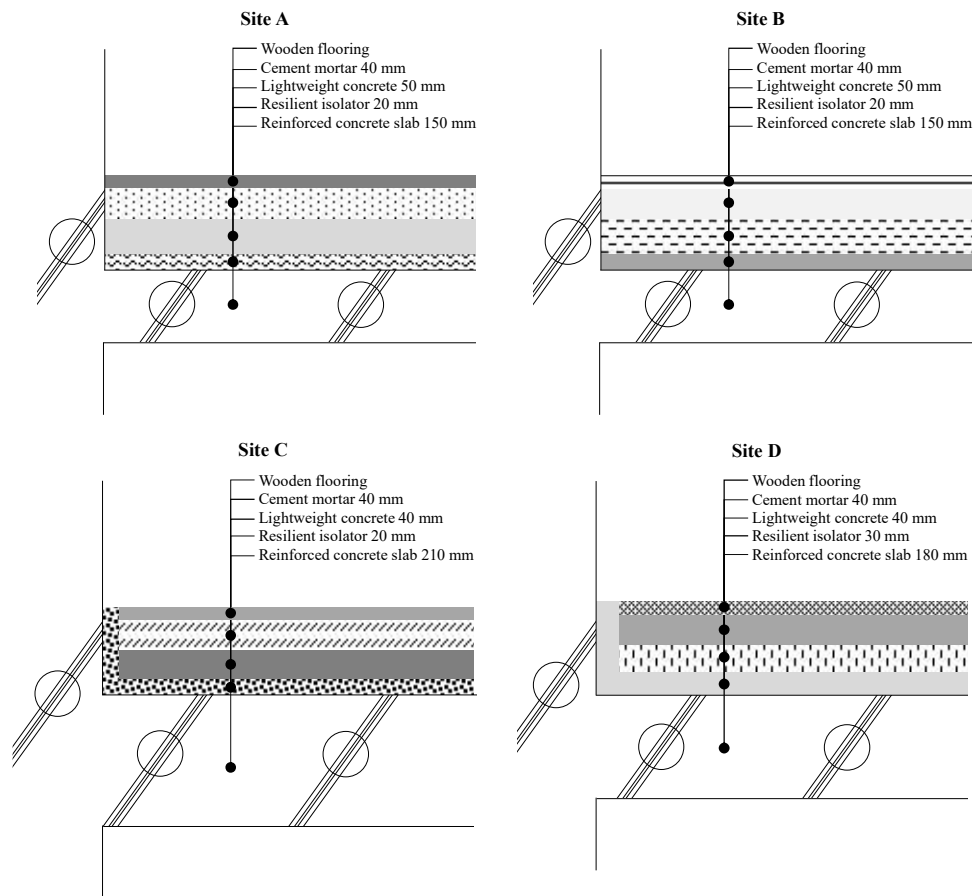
Floor structure of each site. The floors of all sites contained reinforced concrete slab, resilient isolator, lightweight concrete, and cement mortar with different thicknesses and they were finished by wooden floorings.
